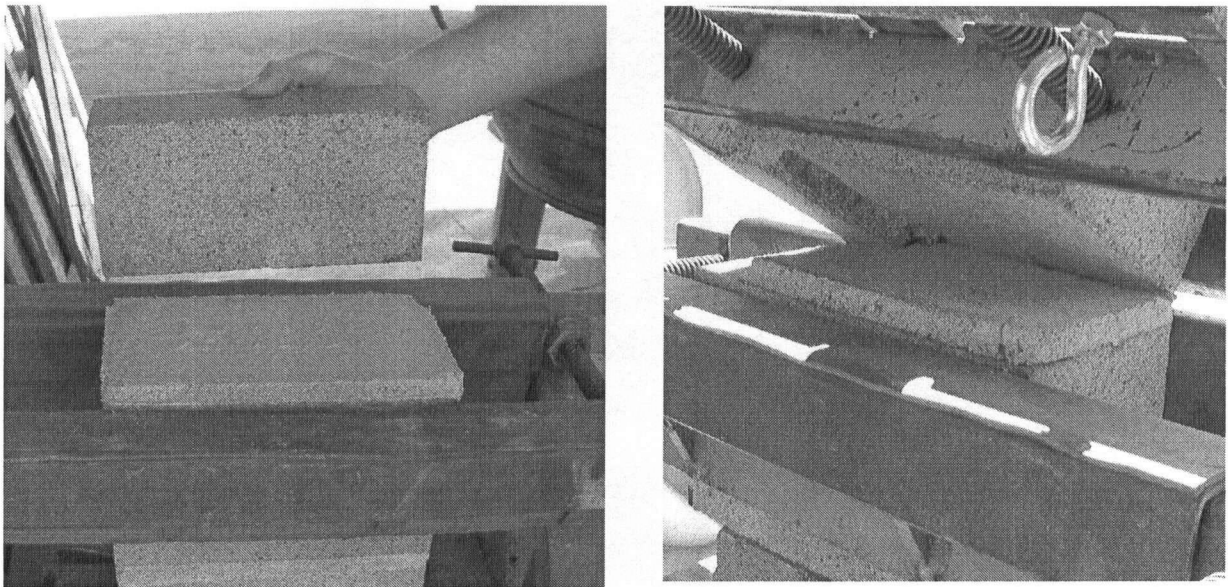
Typical Masonry Bond Wrench Flexural Failure
